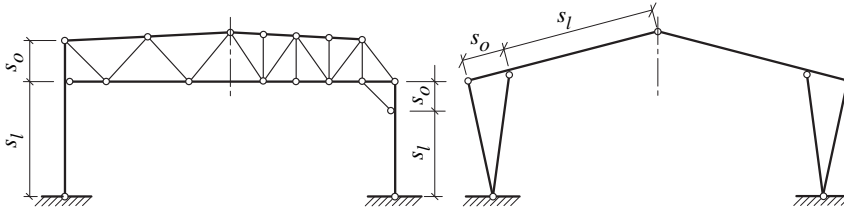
Frame with truss as rafter (left) and three-hinged frame with V-shaped columns (right). (STEP 1995 Article B7)
